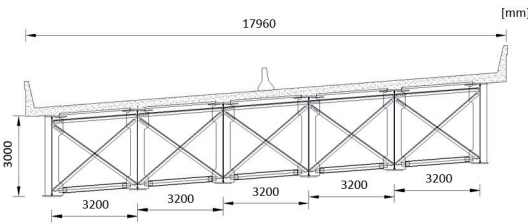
Typical cross section of the bridge. Source: PEDELTA
